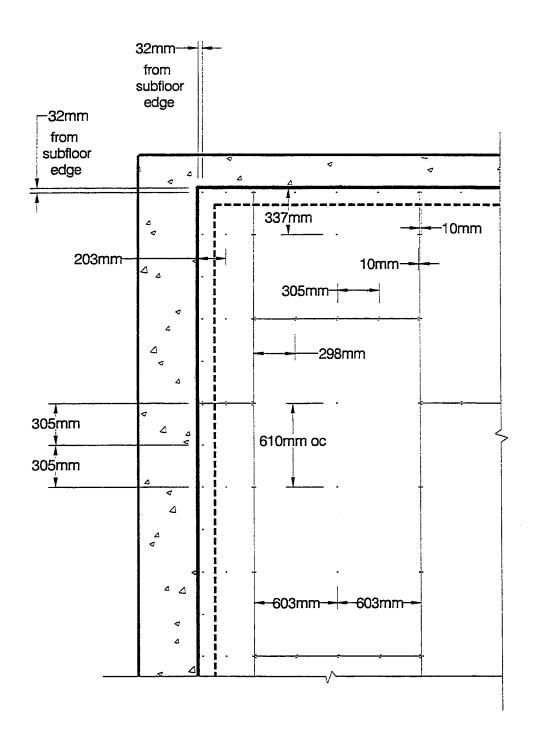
Screw pattern for base layer subfloor, joists 610 mm o.c (10 joists)
